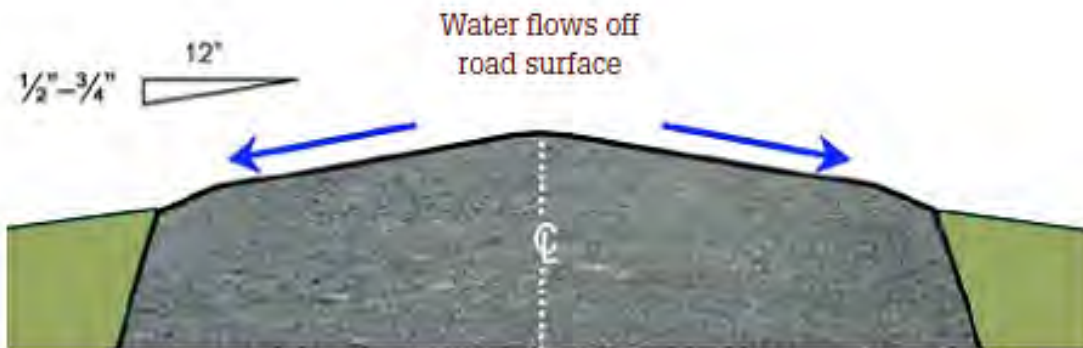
A. Centerline crown with proper cross-slope for an unpaved road. Road drainage flows without obstruction off the road surface into surrounding vegetation. Note the slight grade increase at the road shoulder to encourage off-road drainage (Center for Dirt and Gravel Road Studies, 2005).
